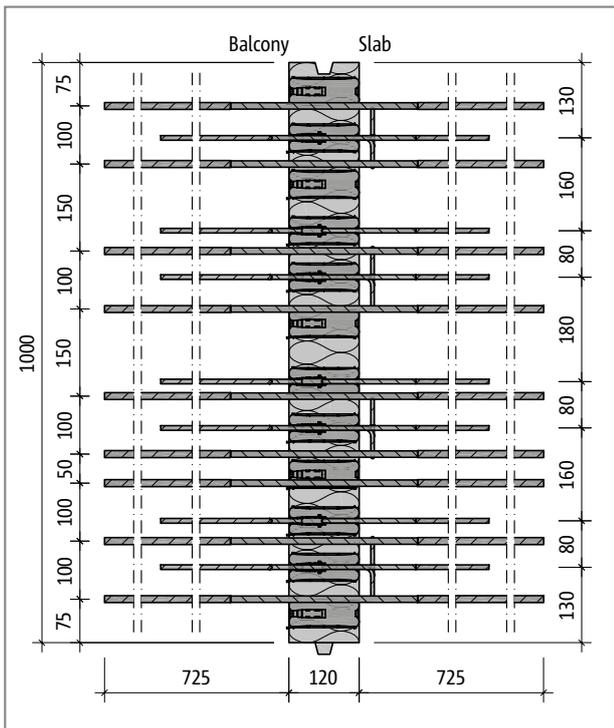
Schöck Isokorb® XT type K-M8: Product plan view
